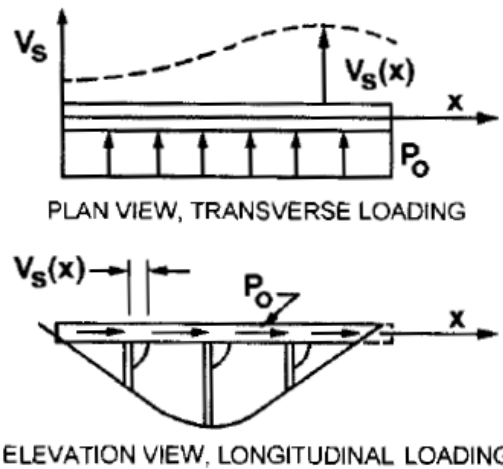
Bridge Deck Subjected to Assumed Transverse and Longitudinal Loading (AASHTO, 2011)
